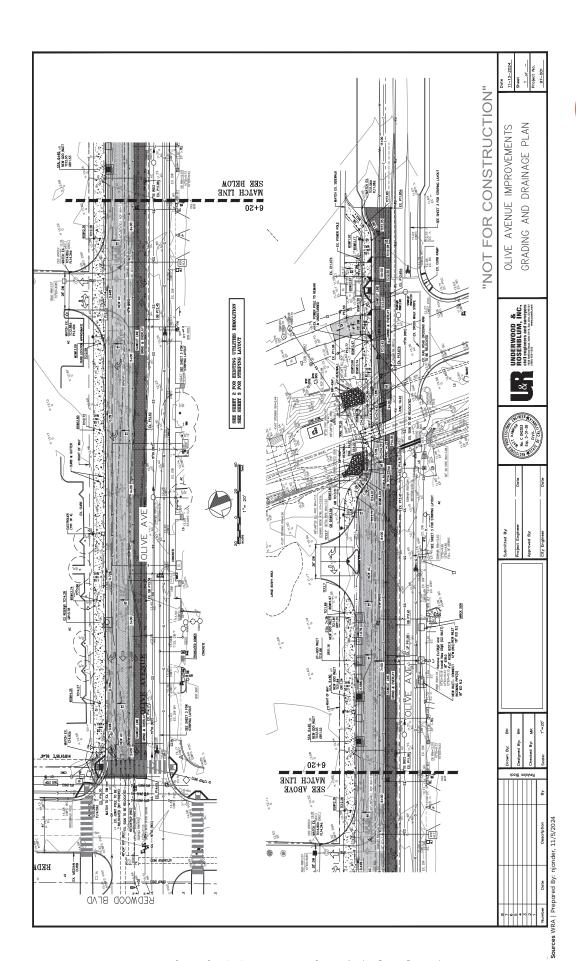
Olive Avenue Site Plans (1 of 3) Drainage and Grading
